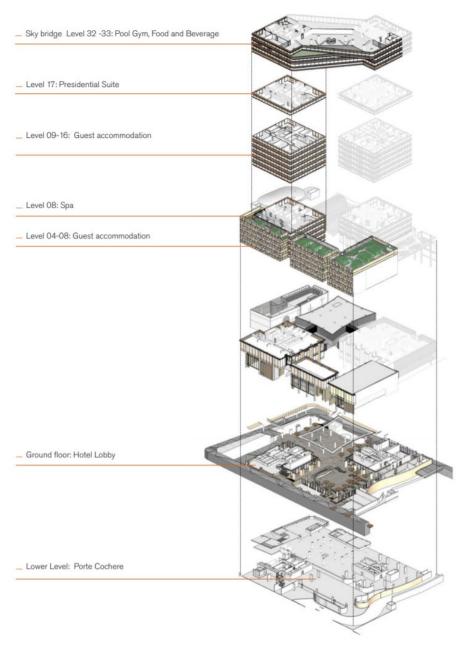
Proposed Hotel Uses (looking south-west from Castlereagh Street)
